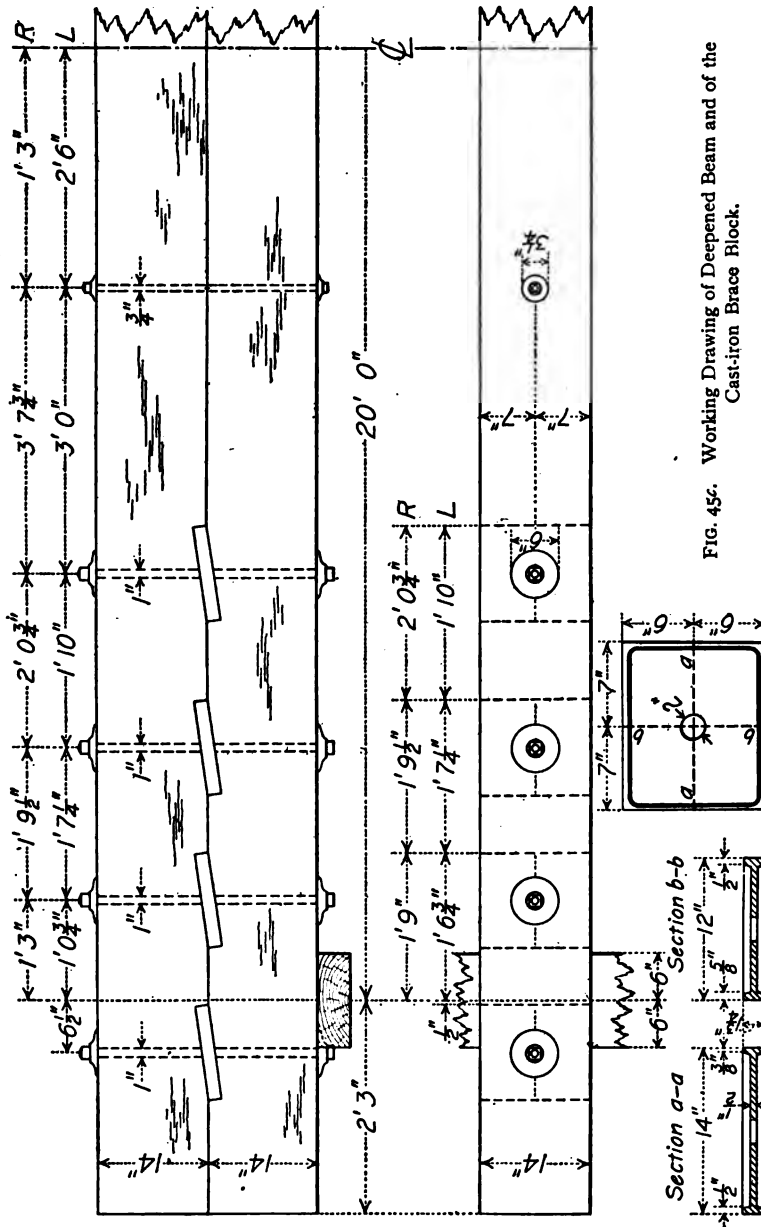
Working Drawing of Deepened Beam and of the Cast-iron Brace Block.
